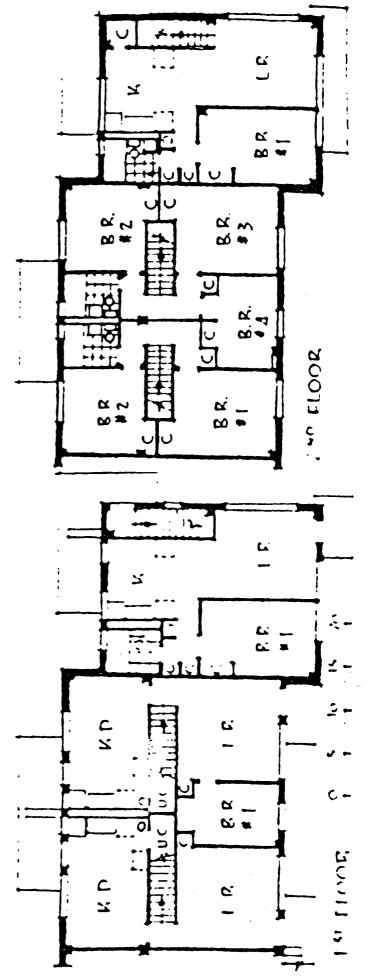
,2 TwoStory Building at End of Row, First and Second Floor
